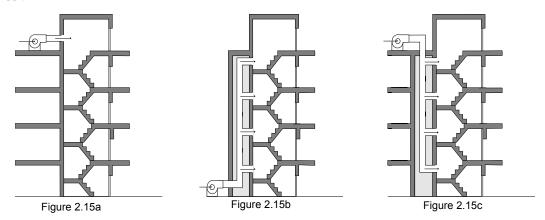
Single and Multiple Injection Stairtower Pressurization Systems
